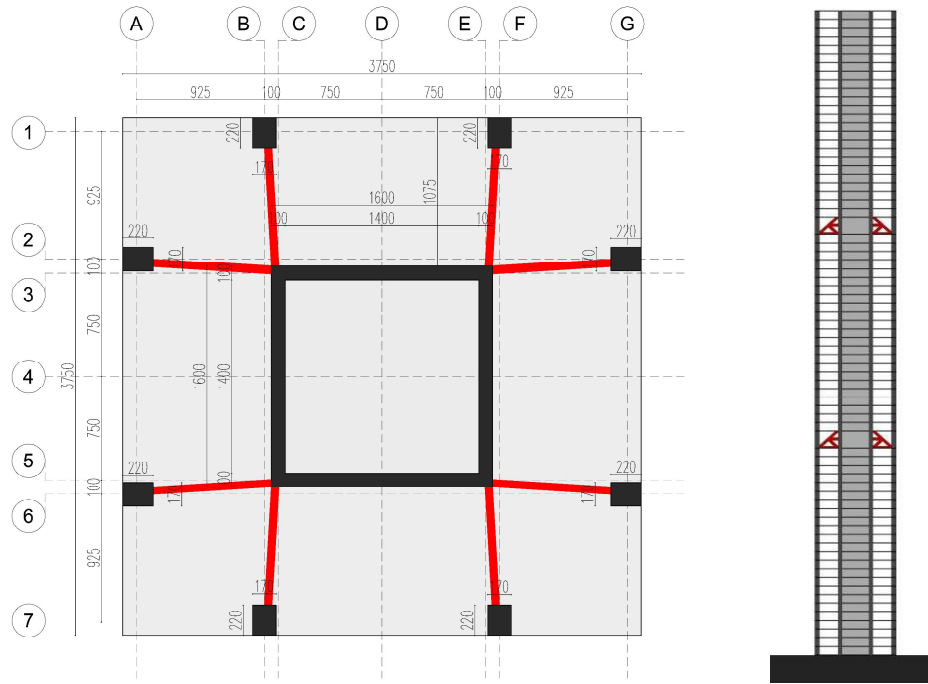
Typical floor plan (left) and elevation (right) of "reduced core building" with outriggered frame system
